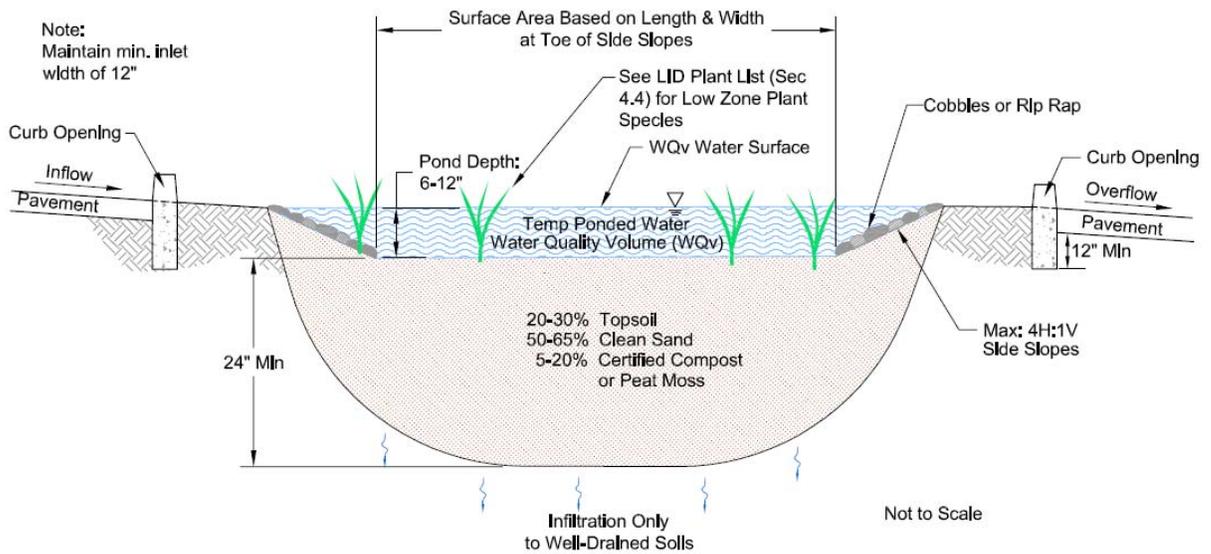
Schematic of a Landscape Detention Basin Located in Existing (Native) Site Soils with an Infiltration of 0.5 inch/hr or Greater (120 min/inch or less)
